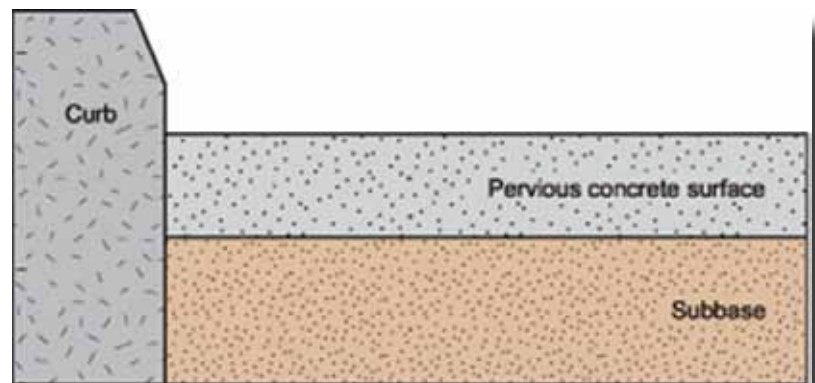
Typical cross section of pervious concrete pavement. On level subgrades, stormwater storage is provided in the pervious concrete surface layer (15% to 25% voids), the subbase (20% to 40% voids), and above the surface to the height of the curb (100% voids).
